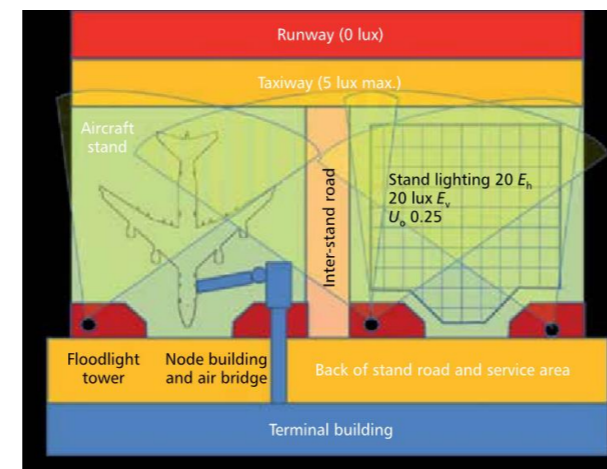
Typical lighting arrangement of pier-served stands (taken from CIBSE LG15).
